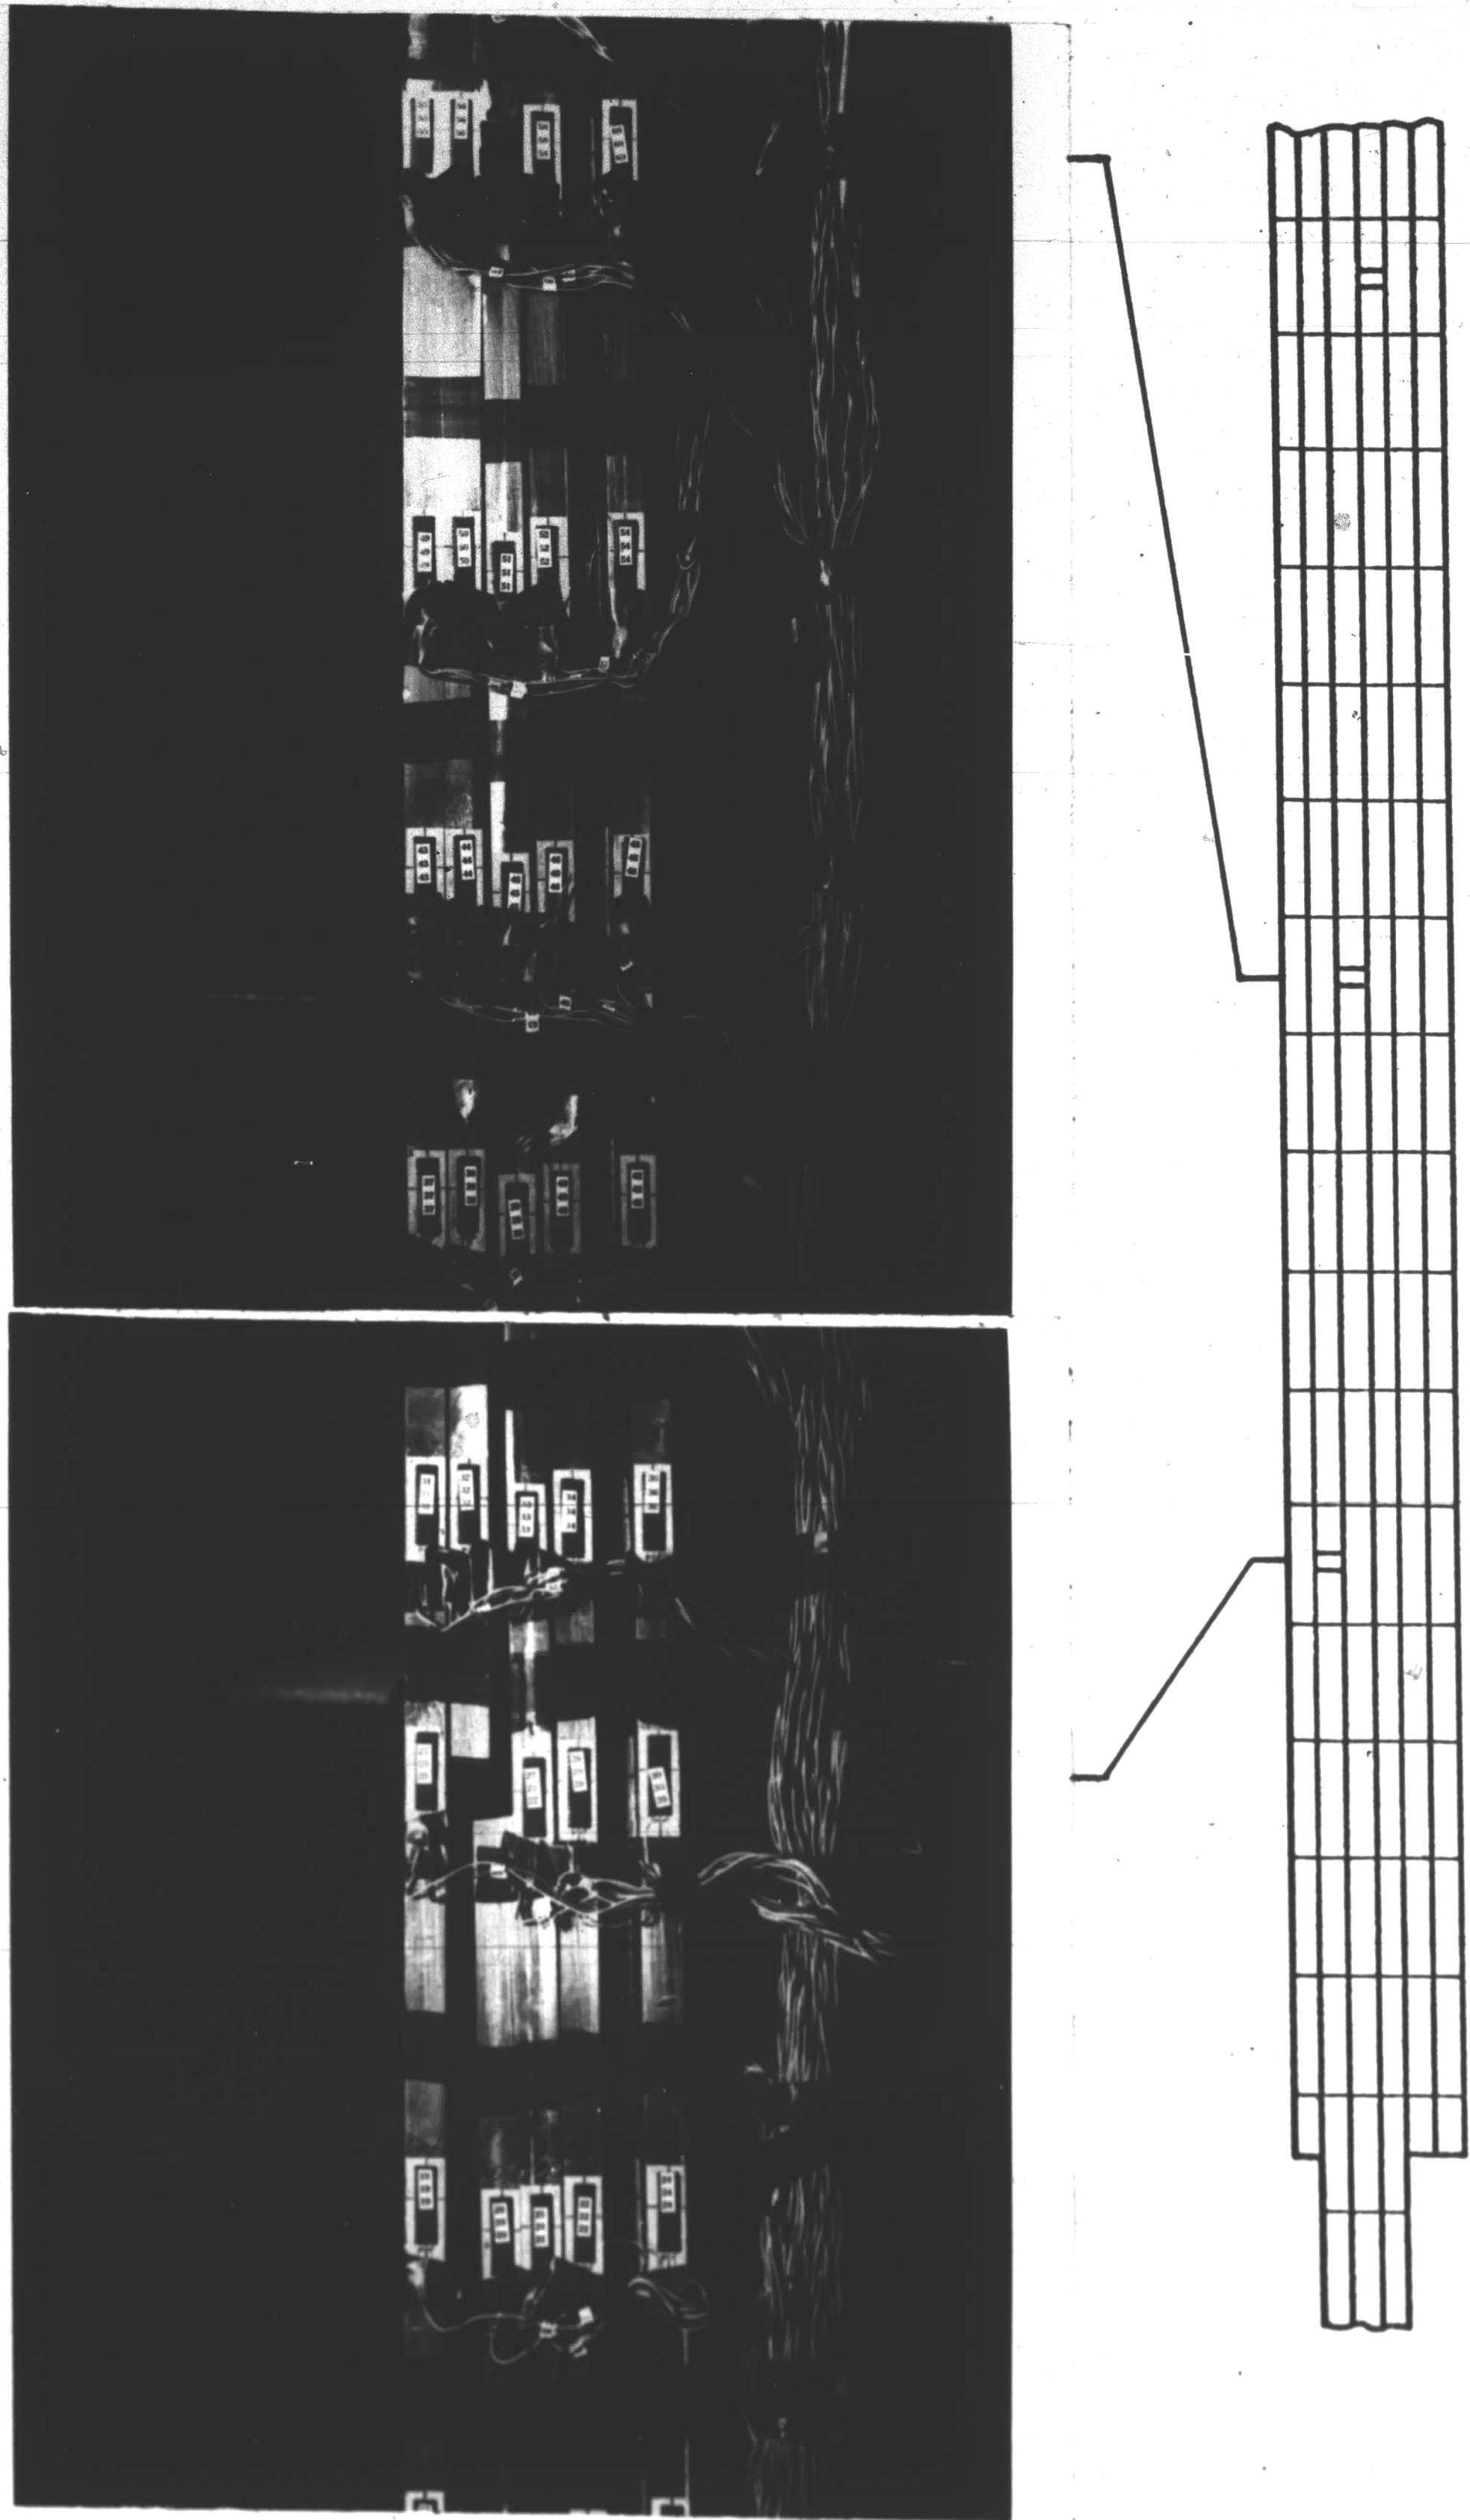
MODIFIED RIVETED JOINT AFTER FAILURE - PORTION II
